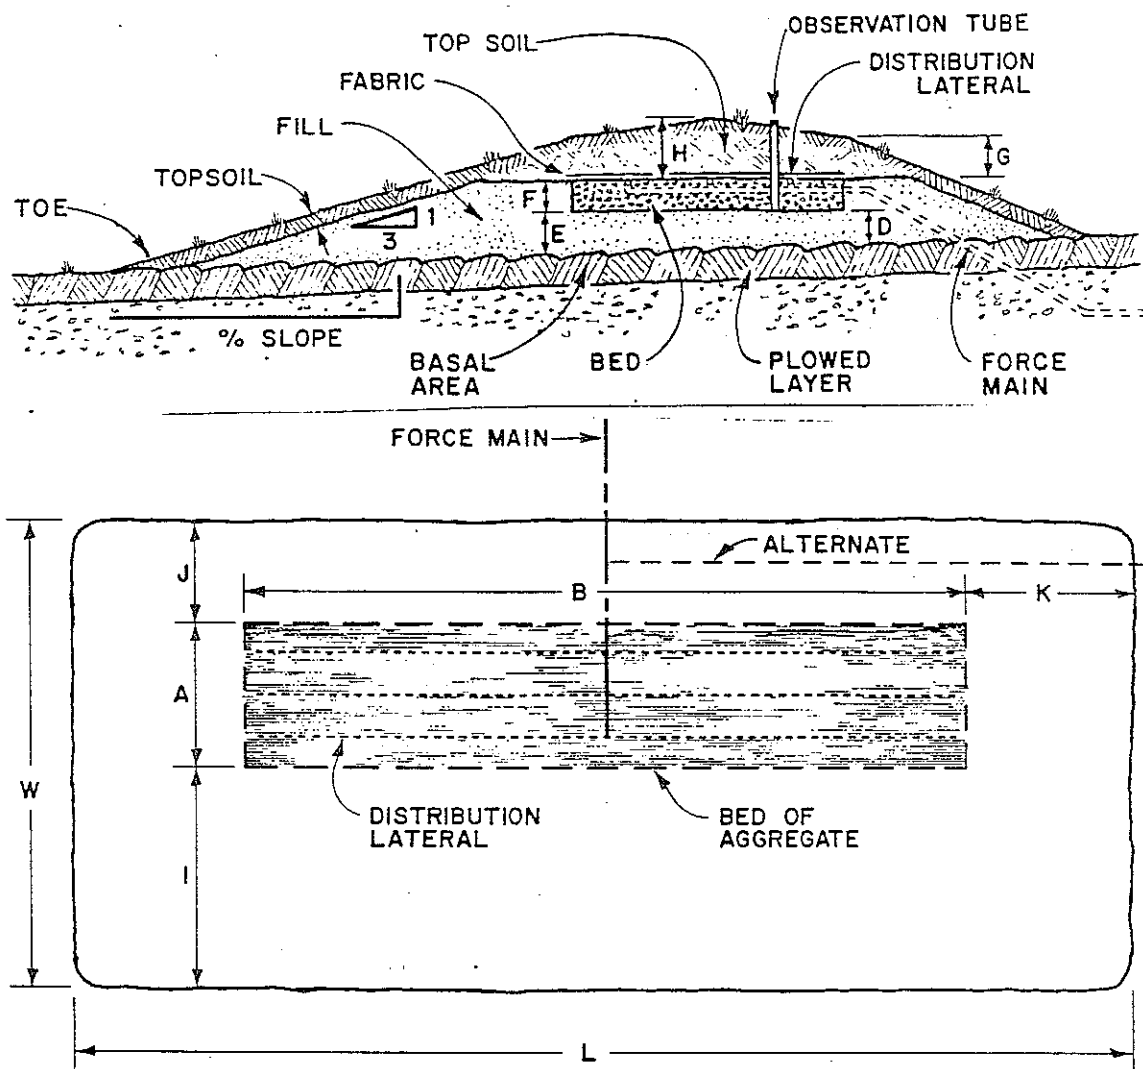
Detailed Cross Section and Plan View of the Wisconsin Mound.
